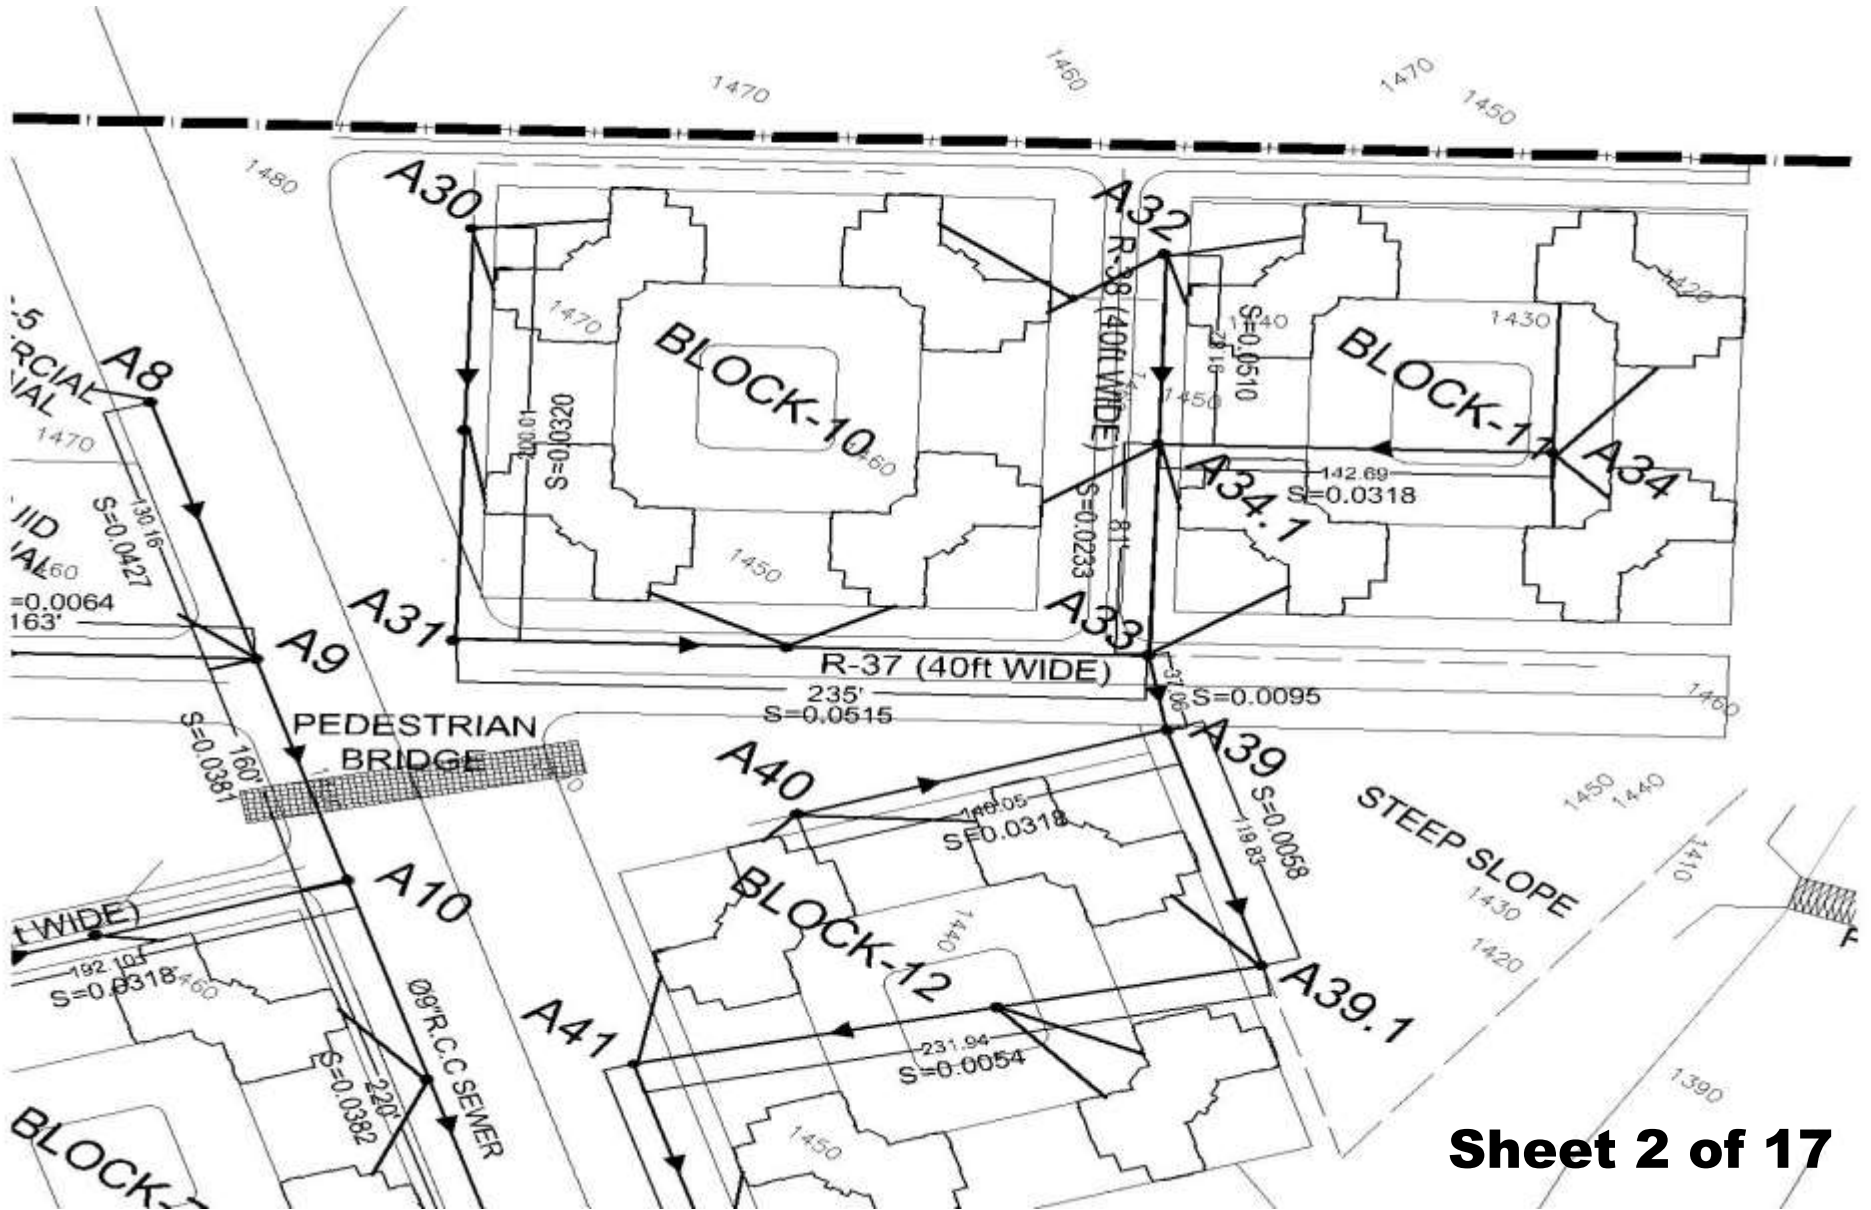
Sewer layout plan for searate system showing 3 zones and legened for detail drawings
